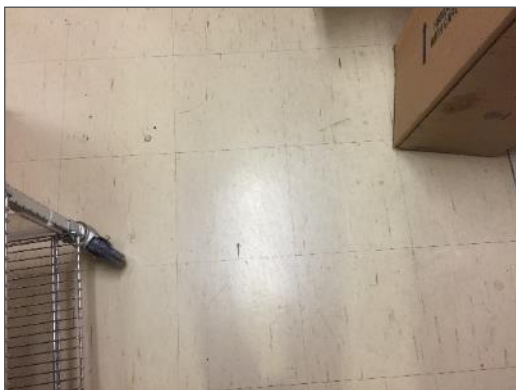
Asbestos-containing 12" x 12" vinyl floor tiles, beige with brown lines, Room 10, Level 0.
